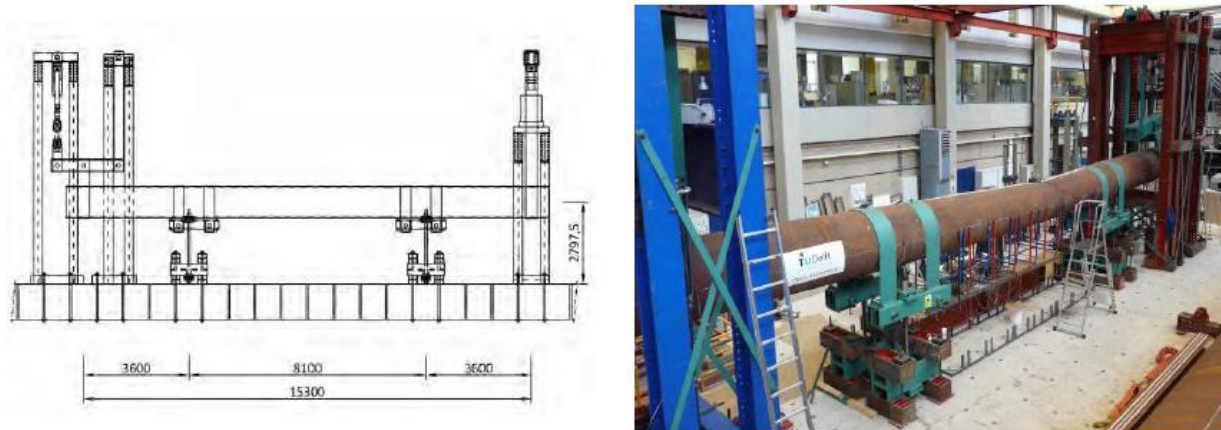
Sketch of the four points bending test set-up (left) and test set-up after formation of a local buckle (right) [103]
